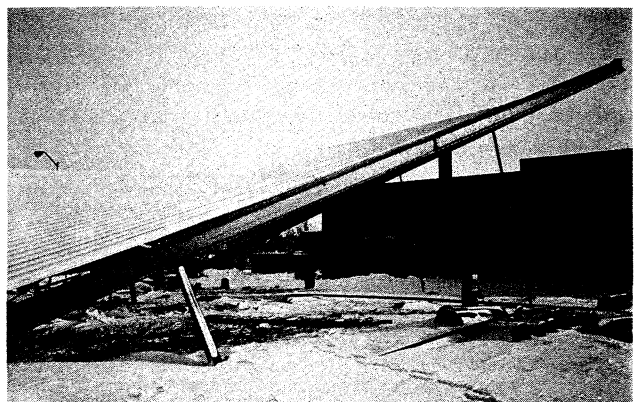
Frame partially sheathed. Although all of the decking was placed while the frame was in position, it was realized that about half of it could have been secured while the frame was on the ground.
